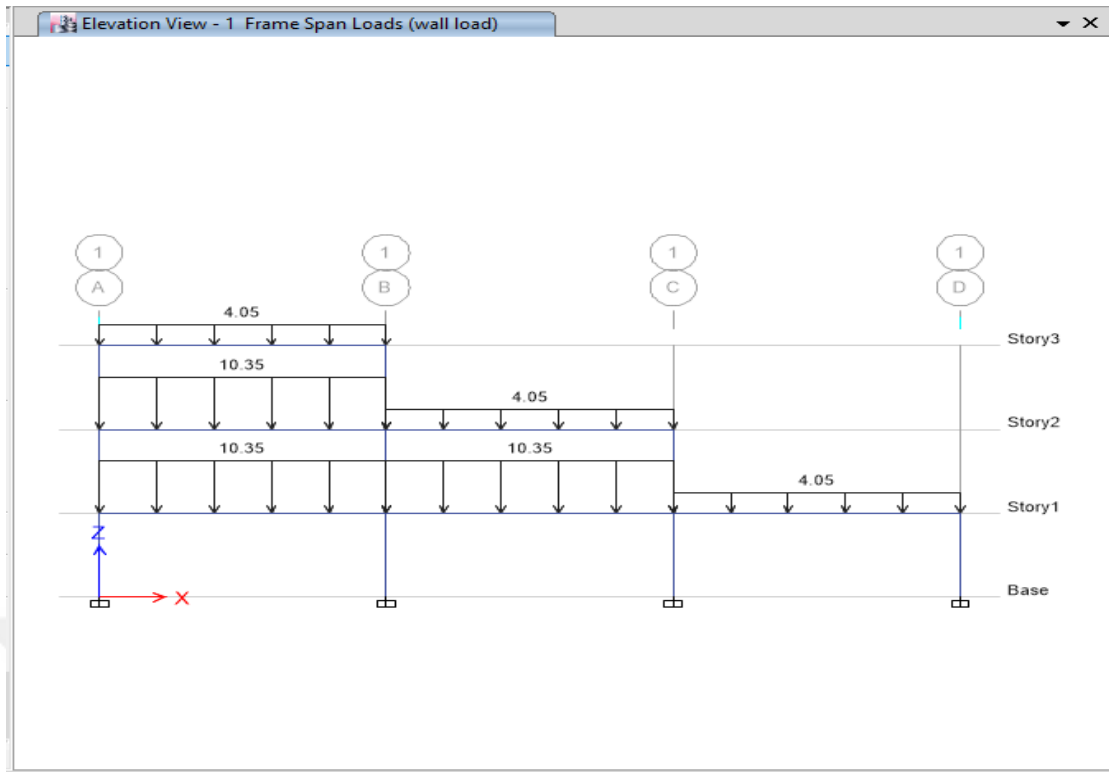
Assigning of wall load to frame 1 in ETABS
